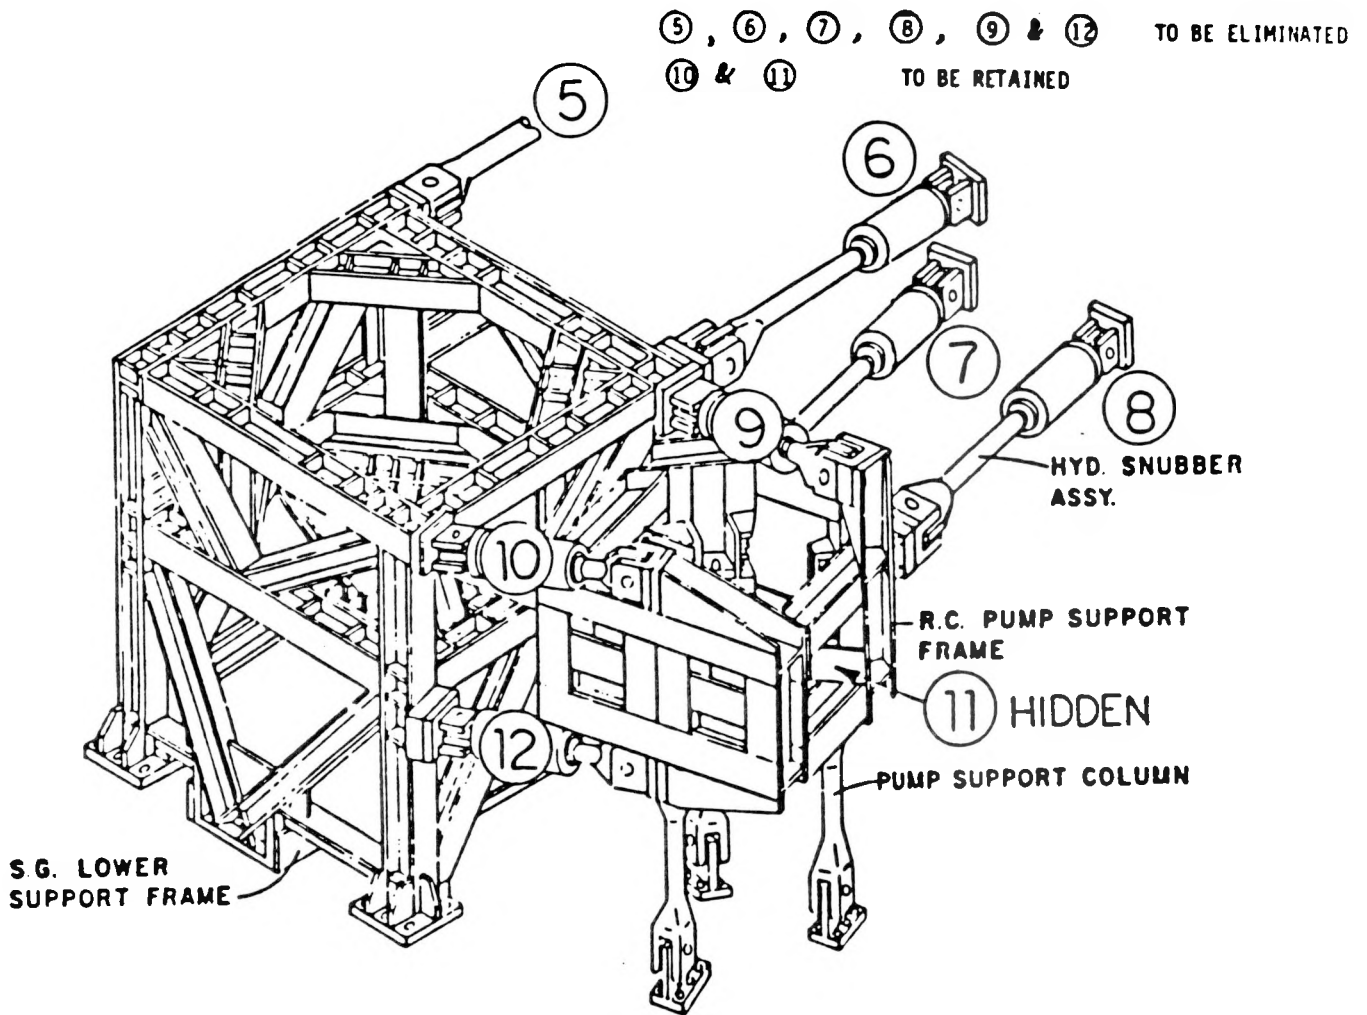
Schematic illustrating typical reduction of snubbers on steam generator lower support and reactor coolant pump support structure based on leak-before-break.
